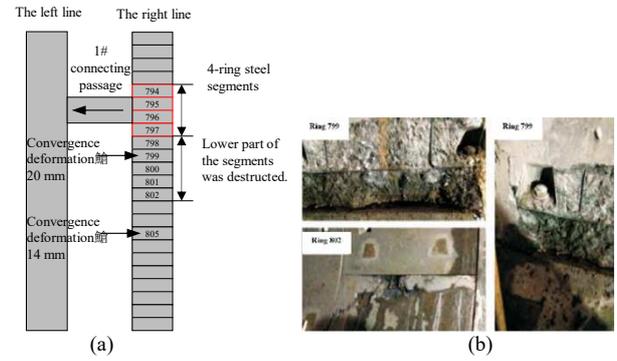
Damage to the shield tunnel due to soil erosion (a) sketch of the lining ring, (b) photos of the concrete spalling.
